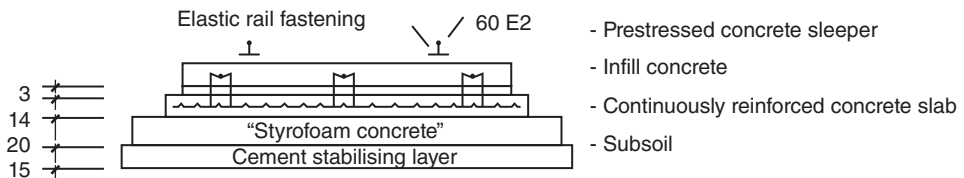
Rheda 1972 superstructure (source: Institute of Road, Railway and Airfield Construction, Technical University of Munich)
